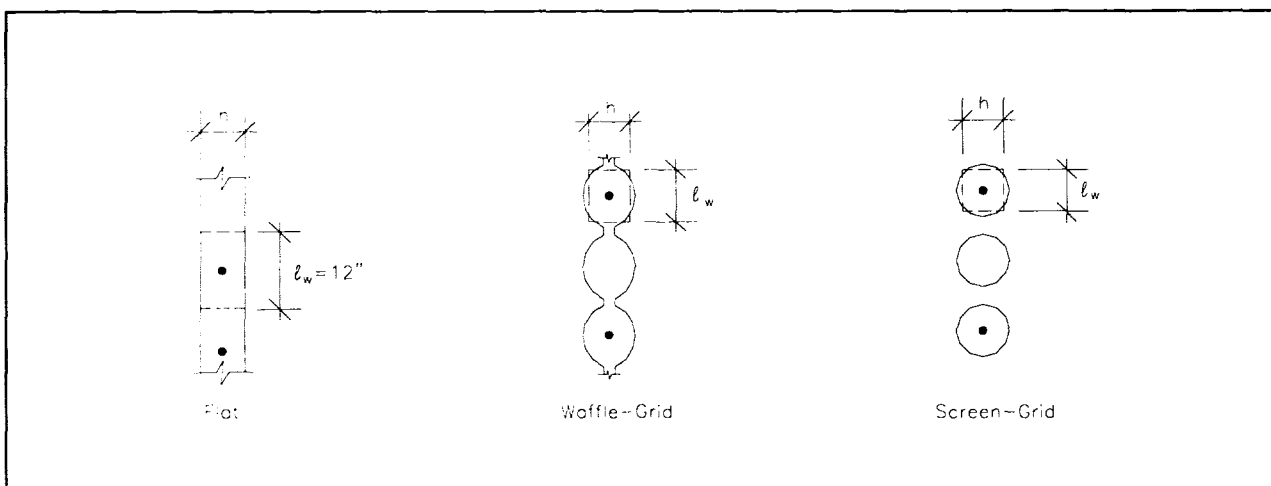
Design Variables Defined for Parallel (In-Plane) Shear Calculations for Structural Reinforced Concrete Walls
